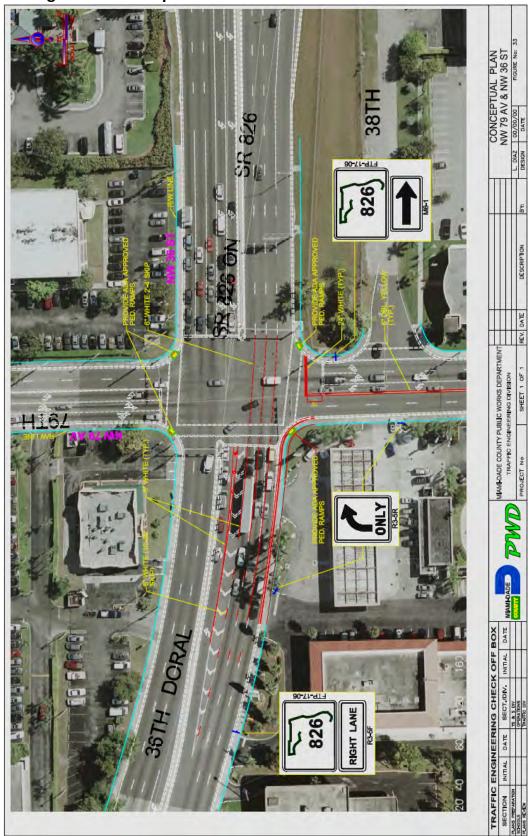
Conceptual Plan – NW 79 Avenue and NW 36 Street
